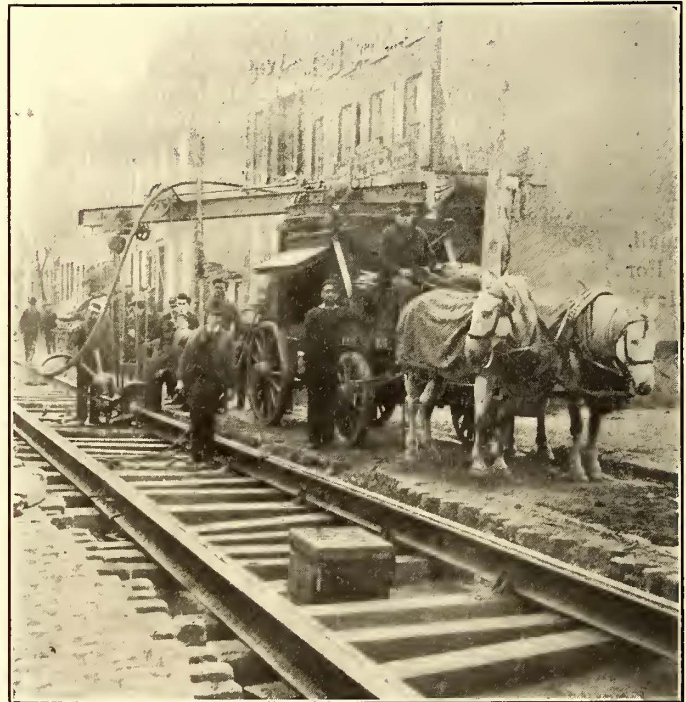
PORTABLE PNEUMATIC RIVETER AT WORK, SHOWING CRANE ARM FOR CARRYING RIVETER
